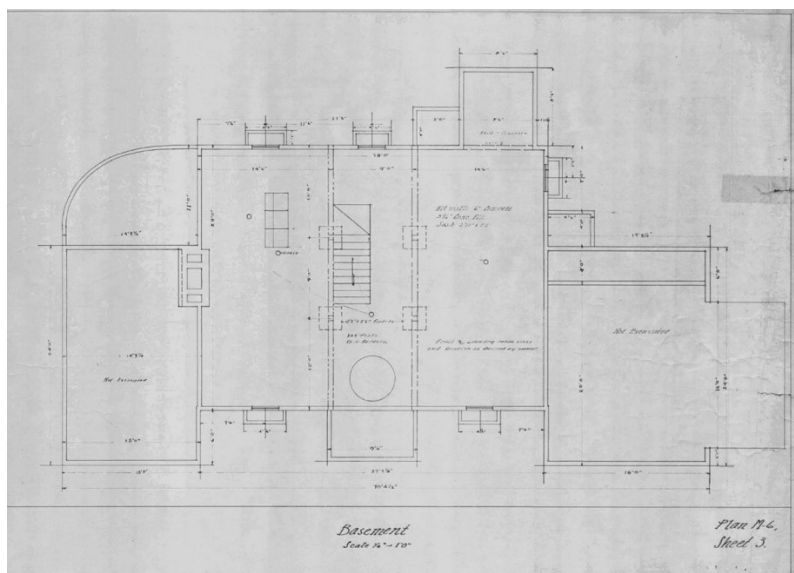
Basement level plan drawing of Dr. and Mrs. E. H. McLean House by Henderson-Bankus Co., Inc.
